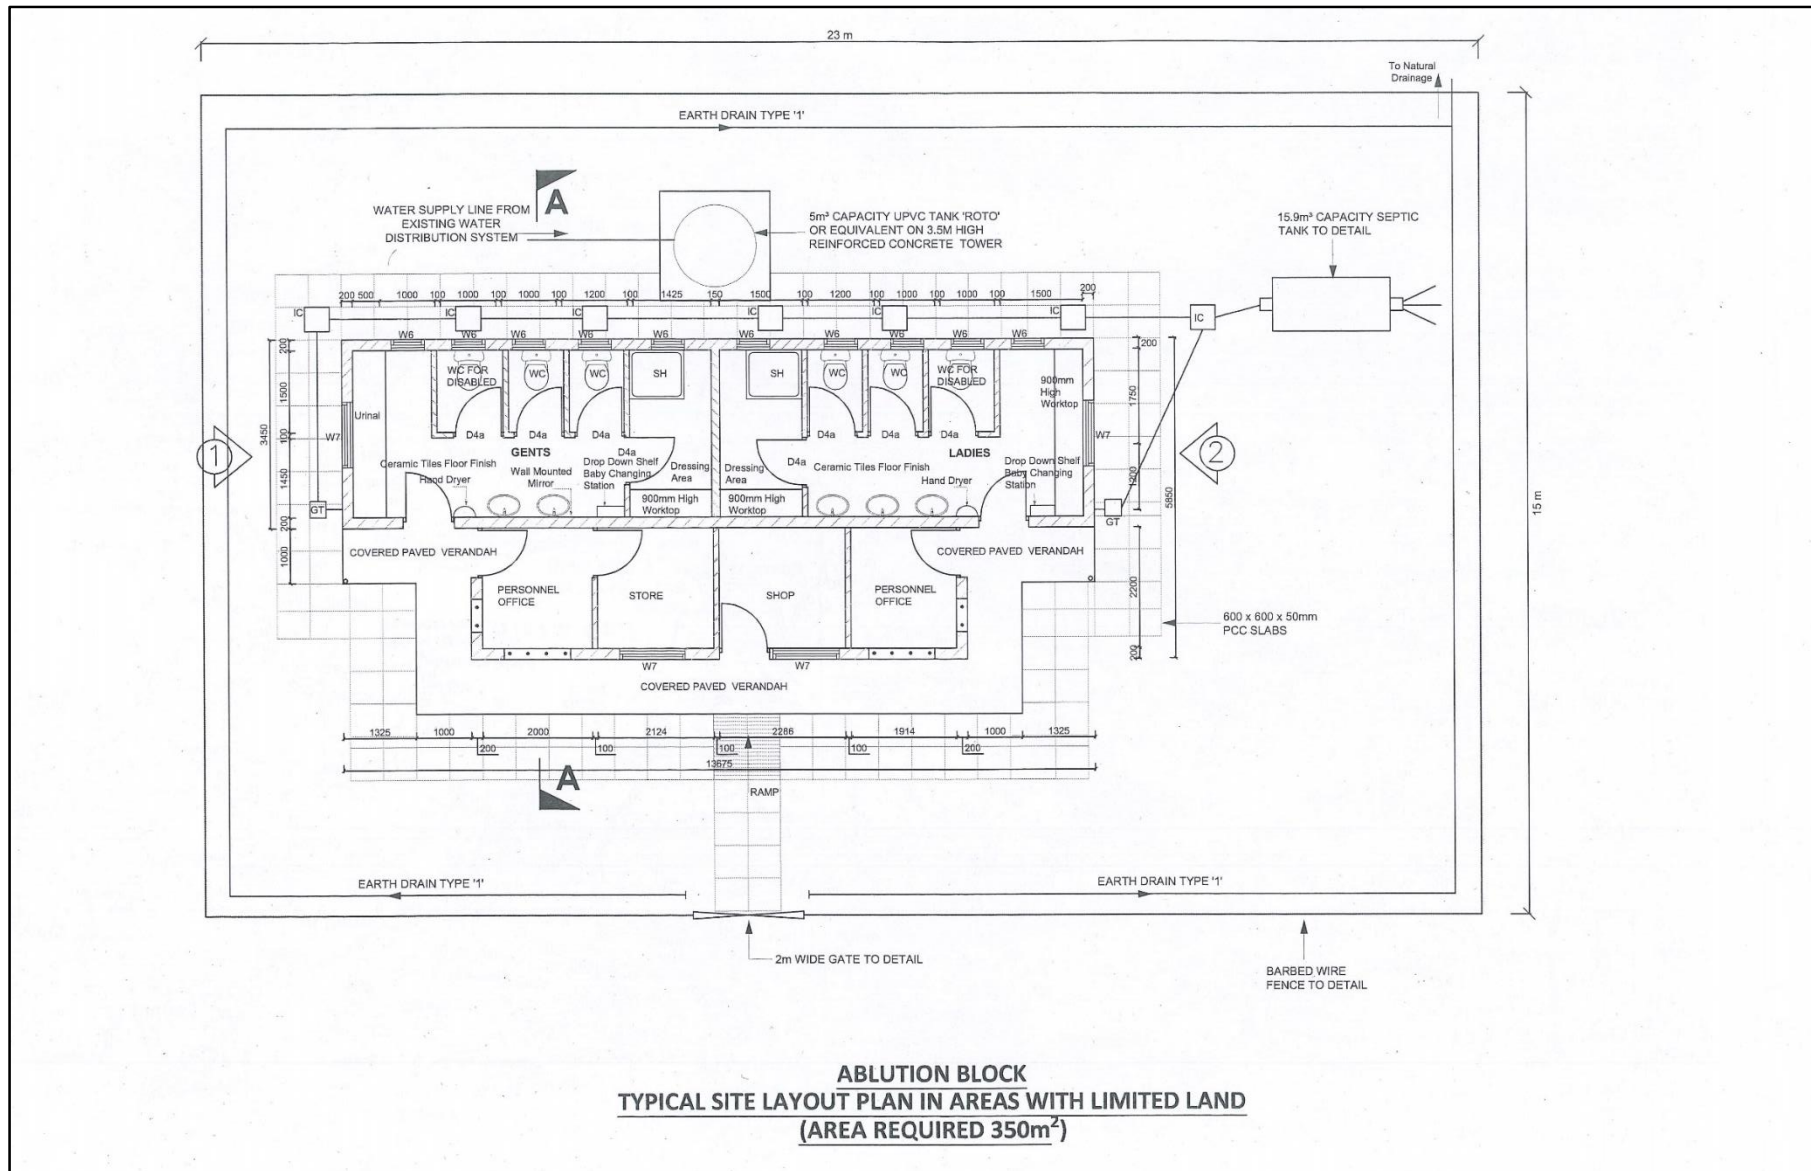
Typical Site Layout Plan for an Ablution Block
